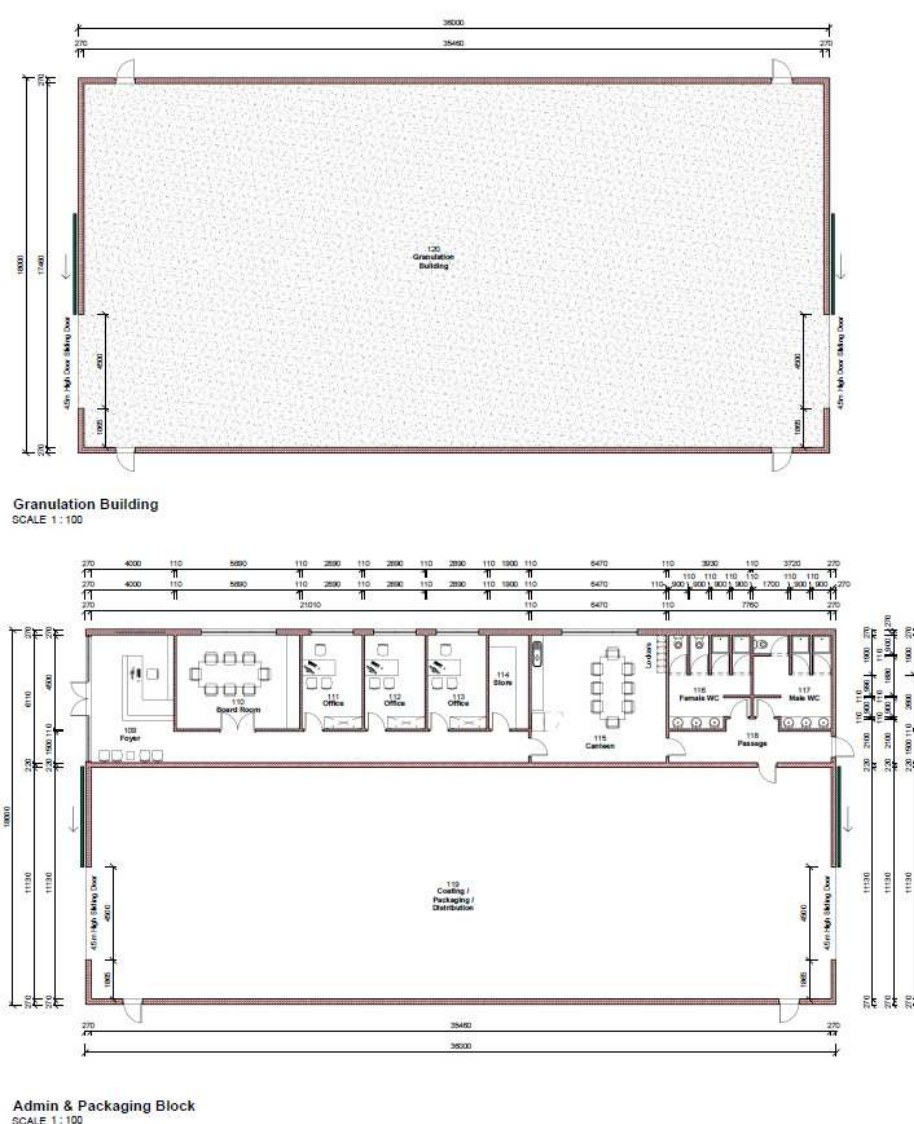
Proposed Floor plans For Granulation Building and Admin Block
